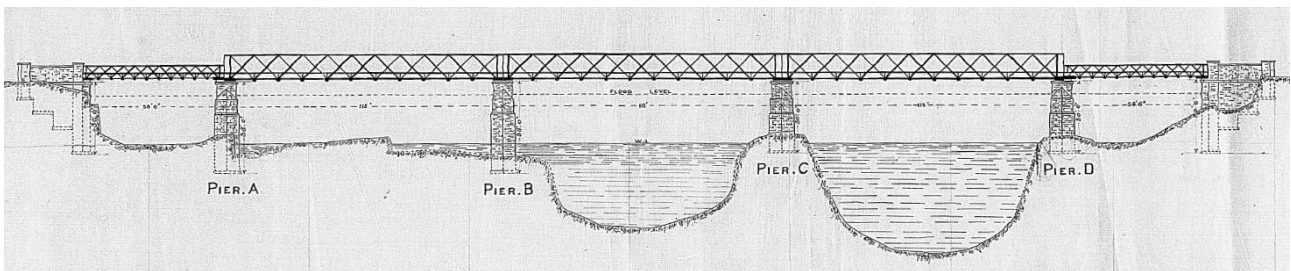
Existing bridge viewed from downstream (Source: PWD, 1885)
